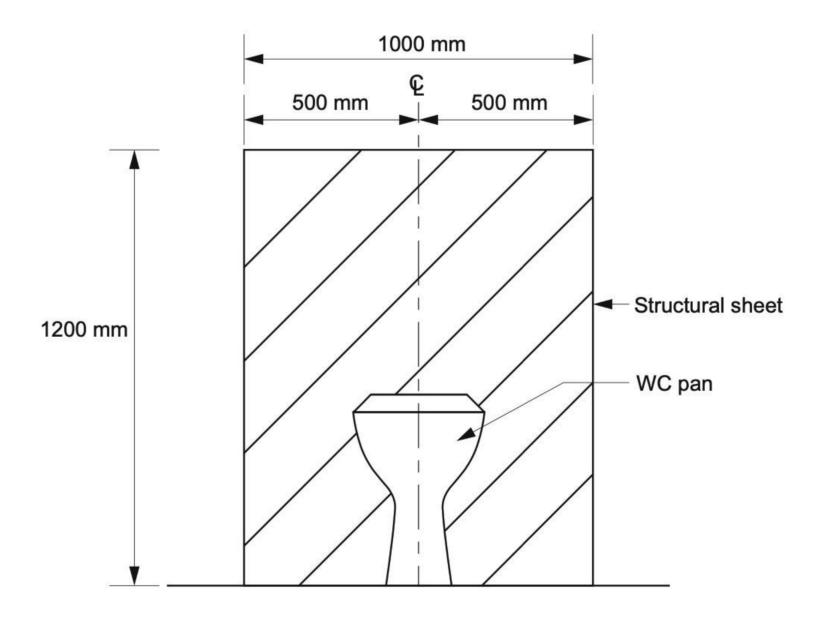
Location of noggings for a wall behind a toilet pan
